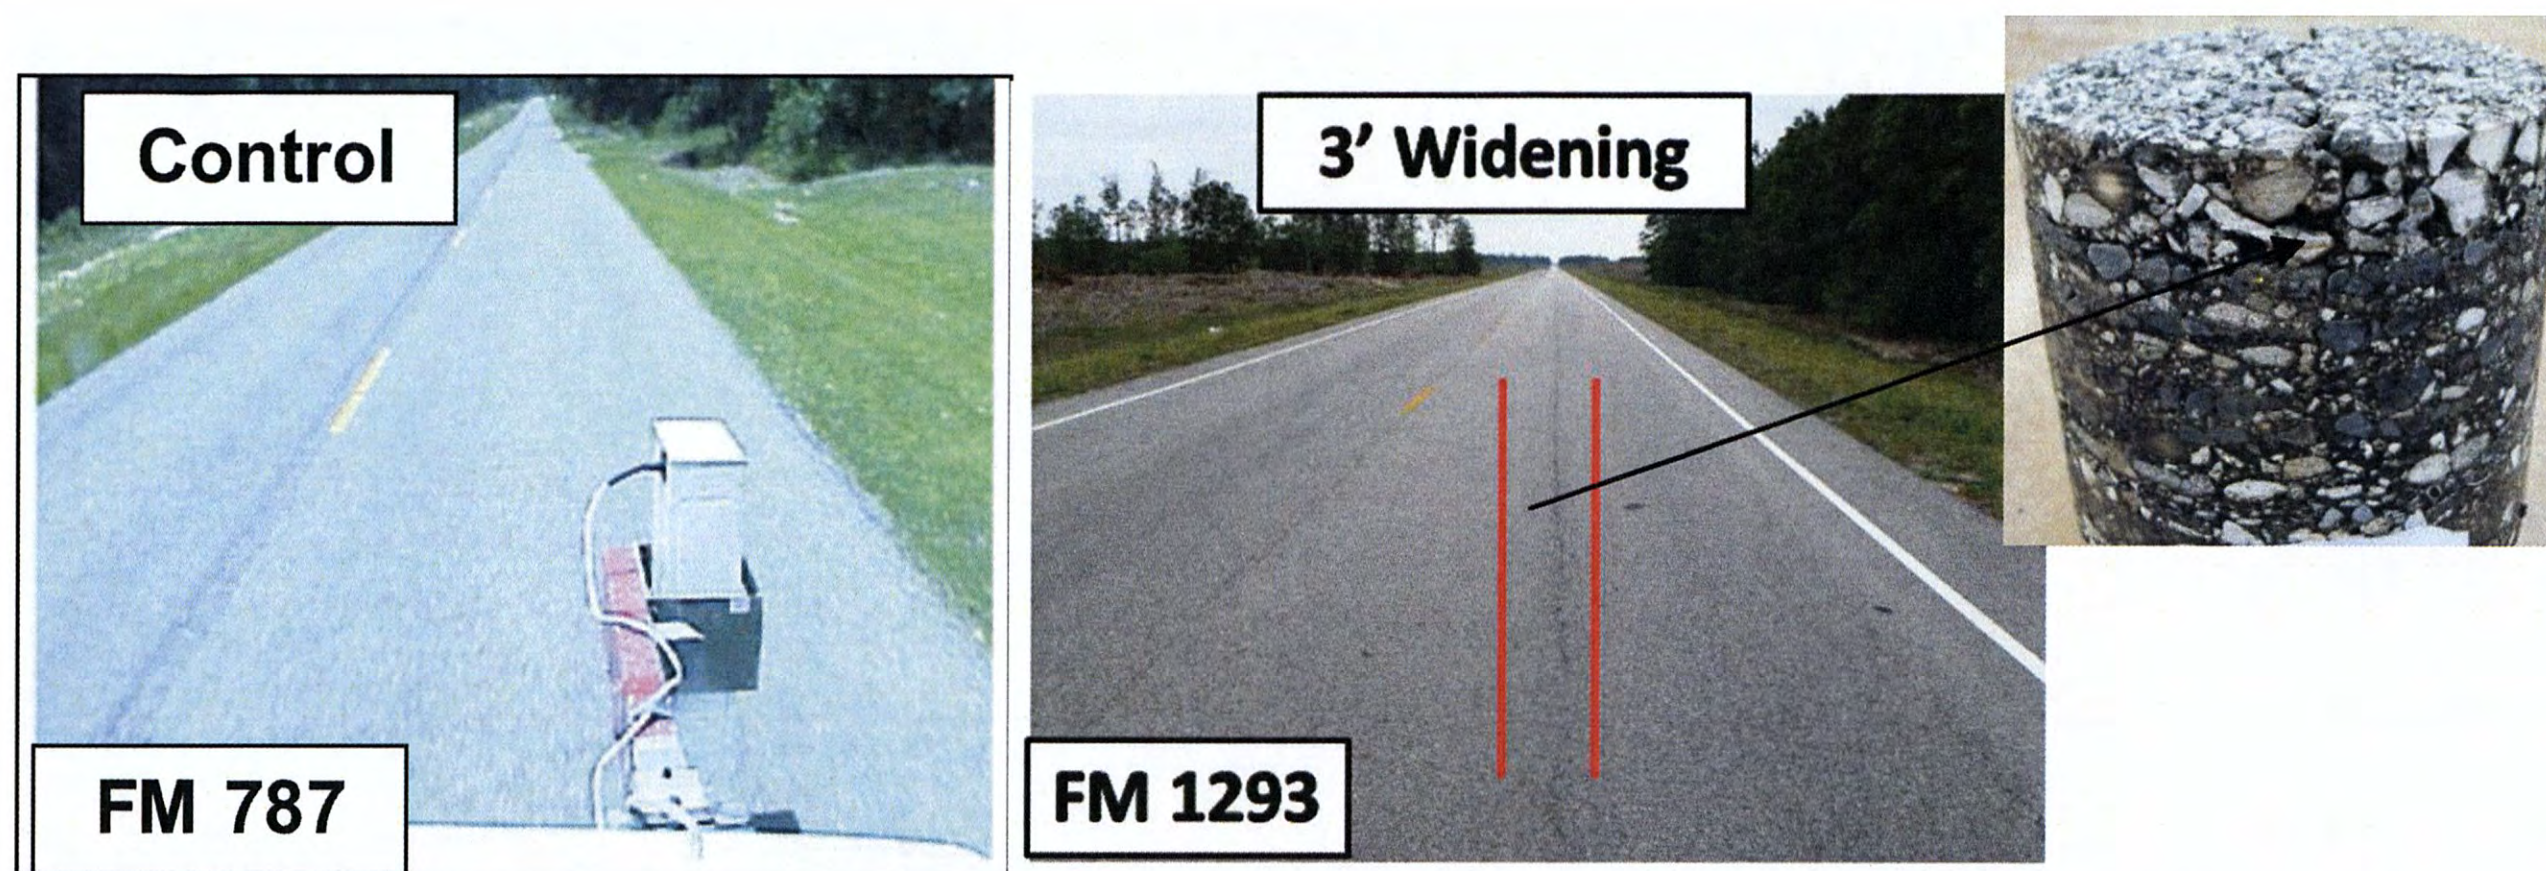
Surface Condition Indicated Distress-Free Narrow Pavement at Control Section and Longitudinal Cracking at Widened Section.
